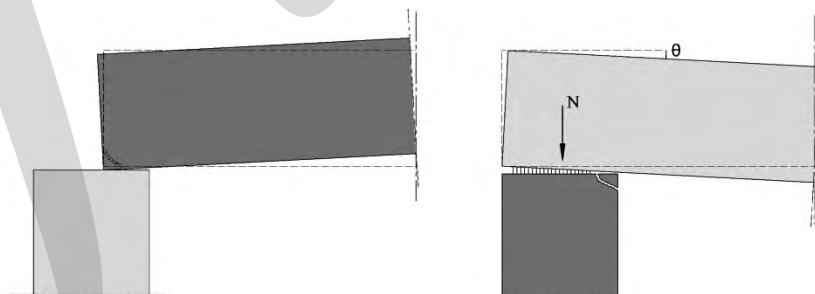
Examples of how connection zones can be damaged because of movements of the precast elements
